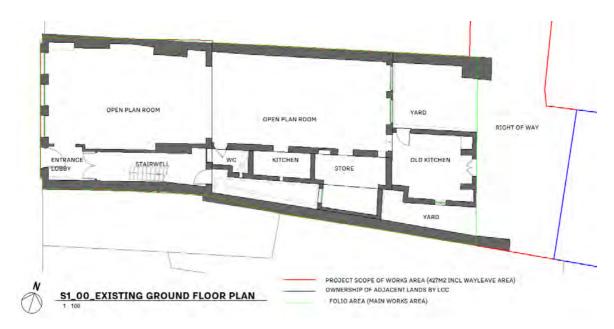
Existing Survey at Ground Floor level -refer to Appendix H
